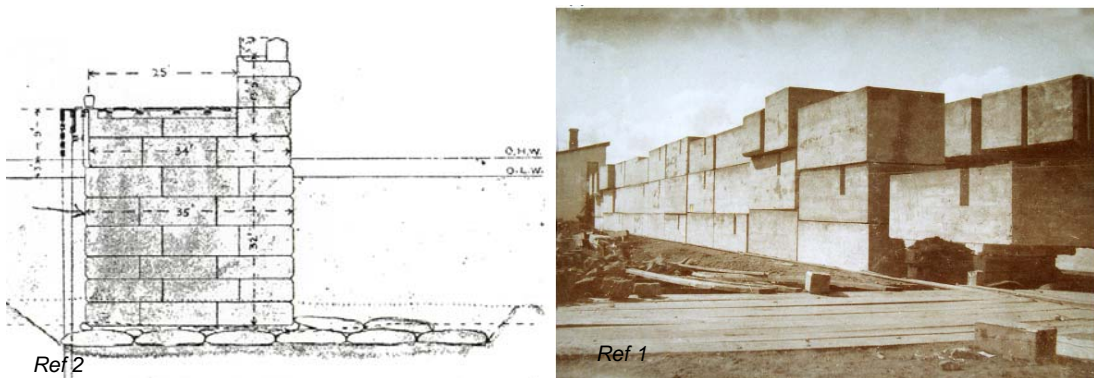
Warrnambool Breakwater keyed concrete block masonry construction
